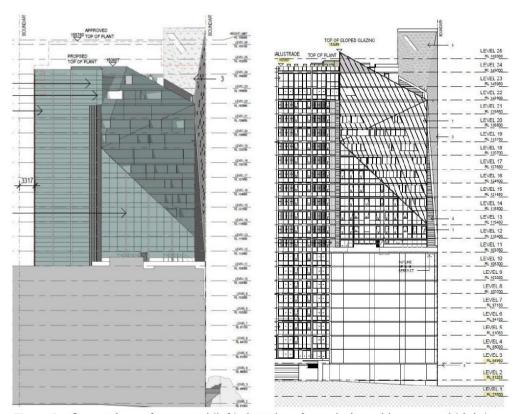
Comparison of approved (left) sloped roof top glazing with proposed (right) *Source:* AJ + C *Architects
